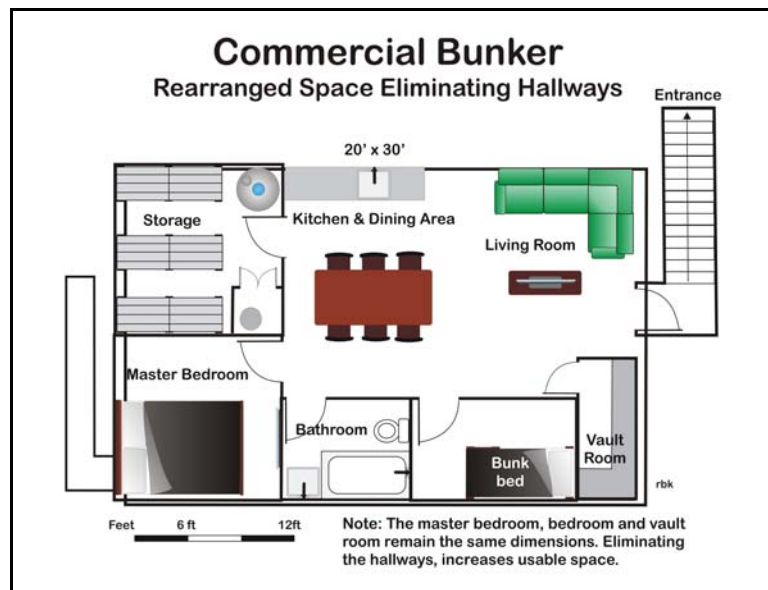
Bunker Floor Plan Redesign – This is the redesign floor plan in Figure 11.8 to eliminate the hallways. Note the increased space and the separation of the master bedroom from the bunk beds. Hallways are dead space. Source: author – [file:\SH-Bunker03.cdr].
